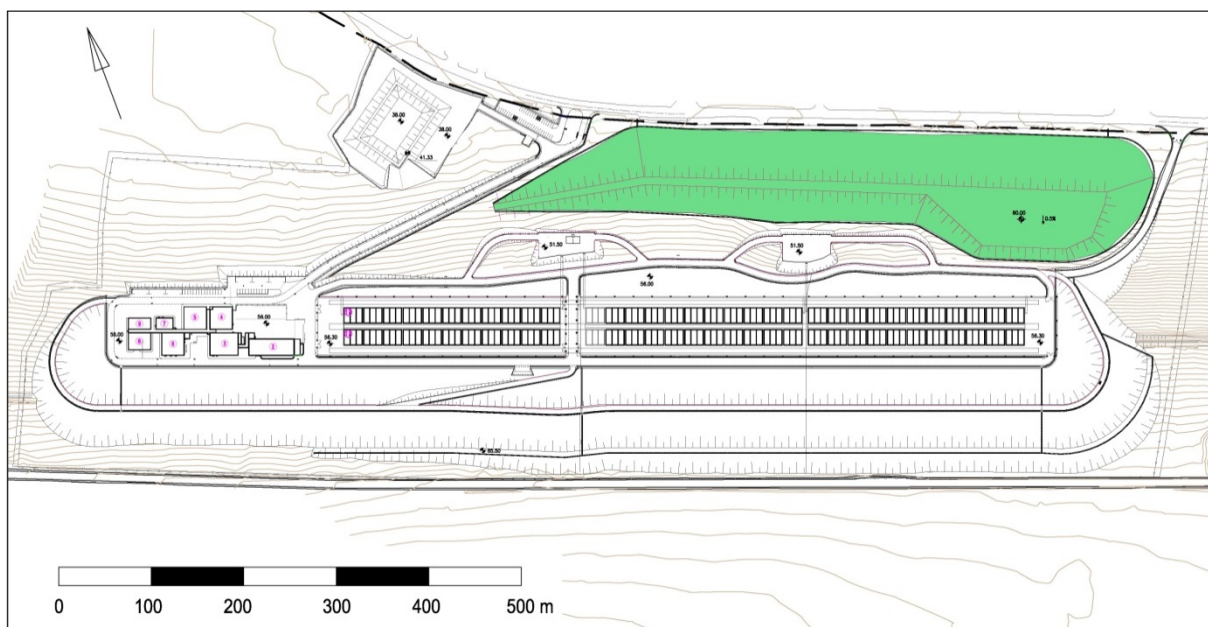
DISPOSAL OF A LANDFILL FOR EARTH MASSES
